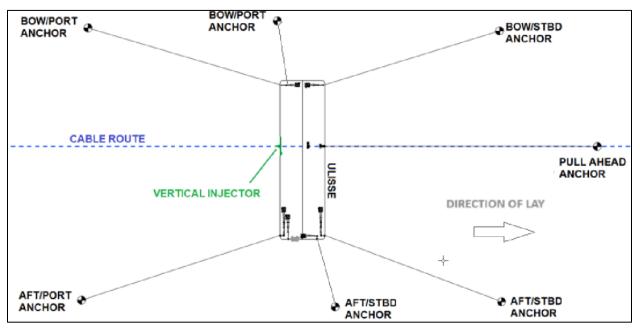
Cable Lay Barge ULISSE planned anchor configuration.
